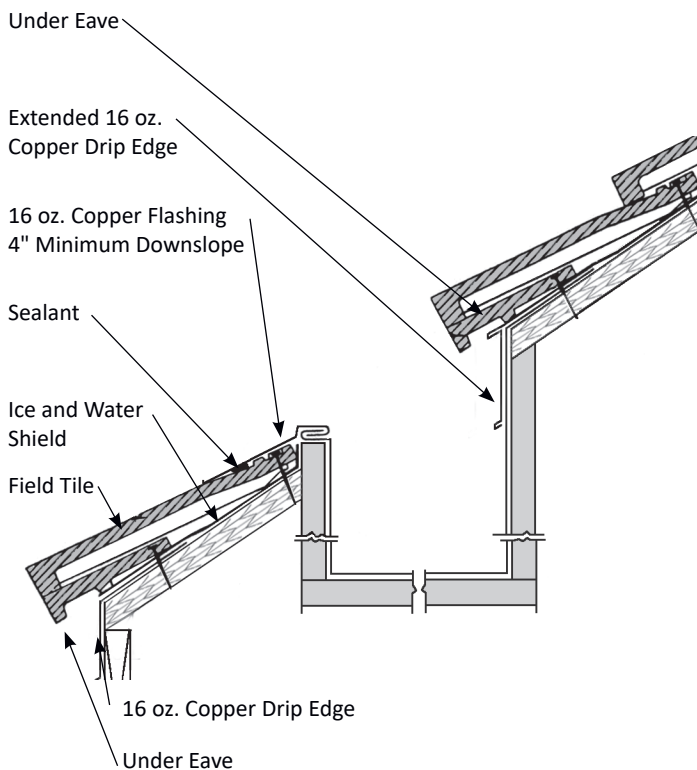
Built in Gutter Detail for Flat Interlocking Tile
